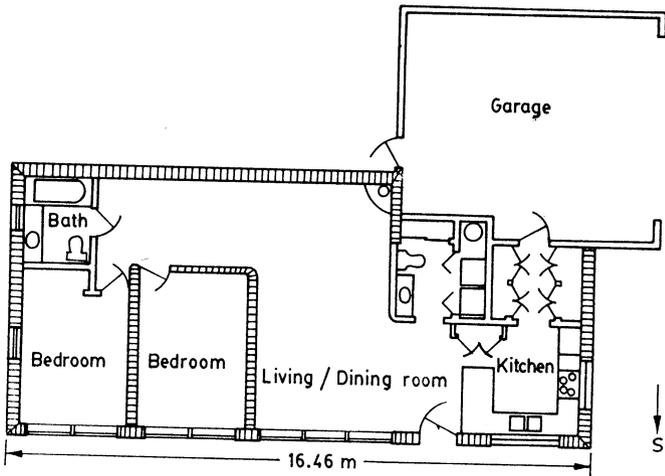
FLOOR PLAN OF WILLIAMSON HOUSE (From SANDIA[29])
